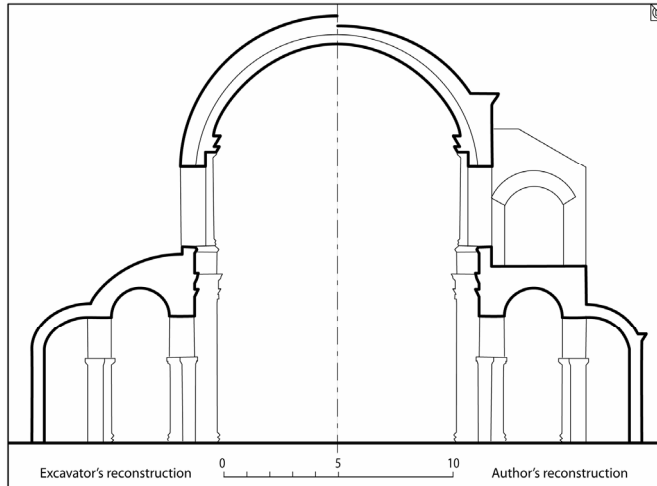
Bath, England. Section through Great Bath showing two proposed reconstructions.
